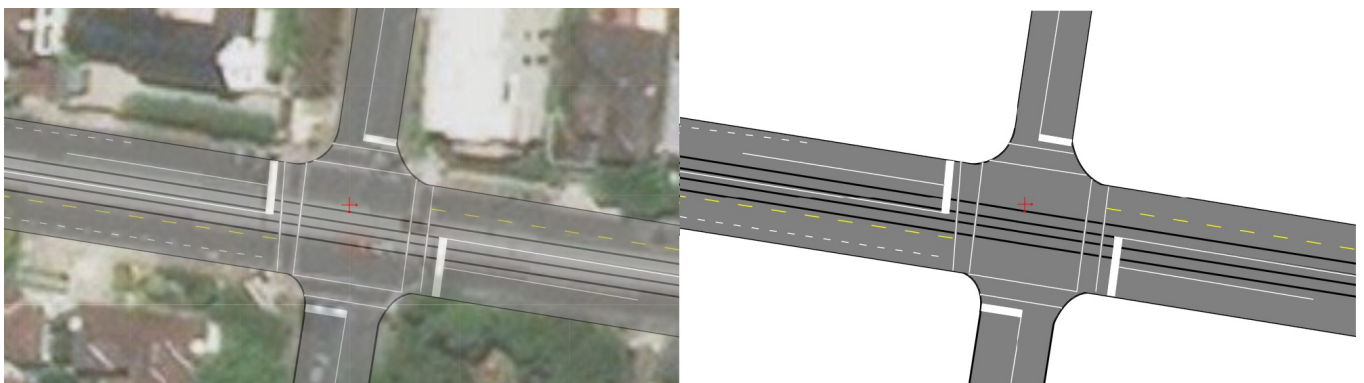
Completed Plan Satellite on Show (Left) Completed Plan No Satellite (Right)
